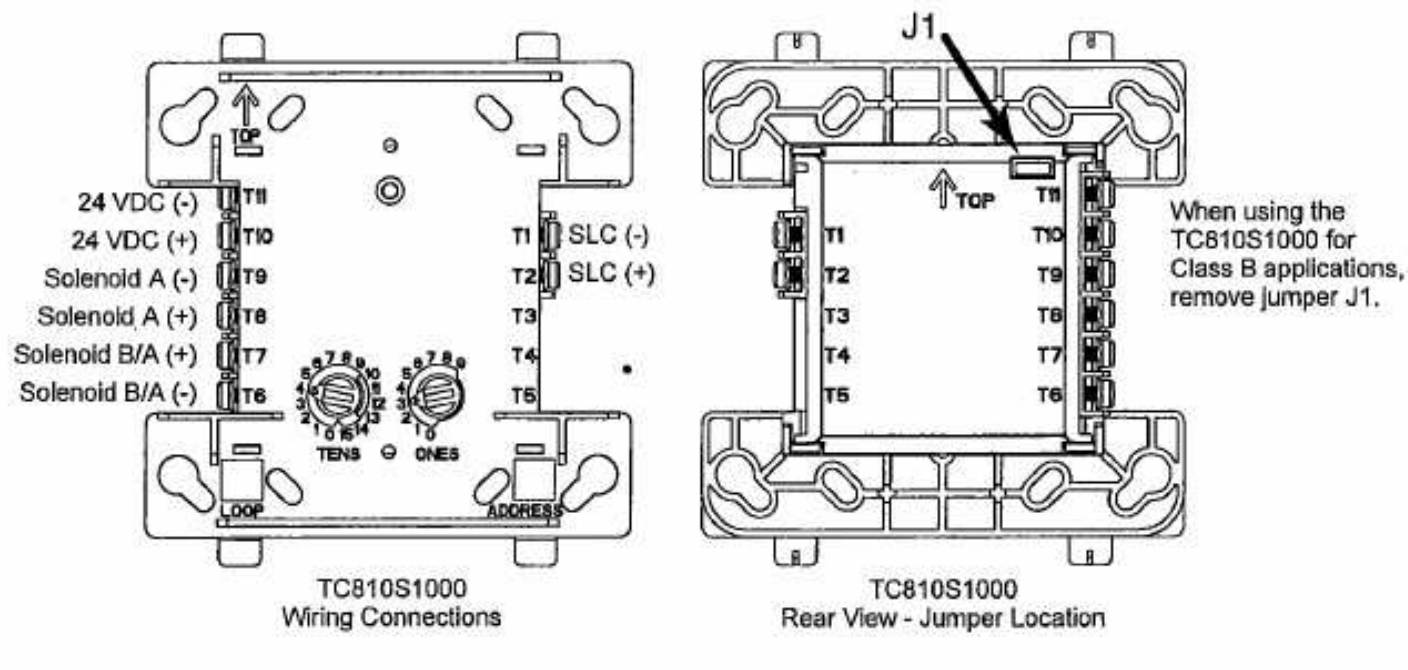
TC810S1000 Wiring Locations and Rear View - Jumper Location
